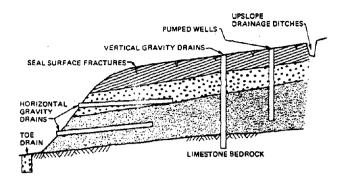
Subhorizontal and vertical drains used to lower ground water in natural slopes (Gedney and Weber, 1978)
